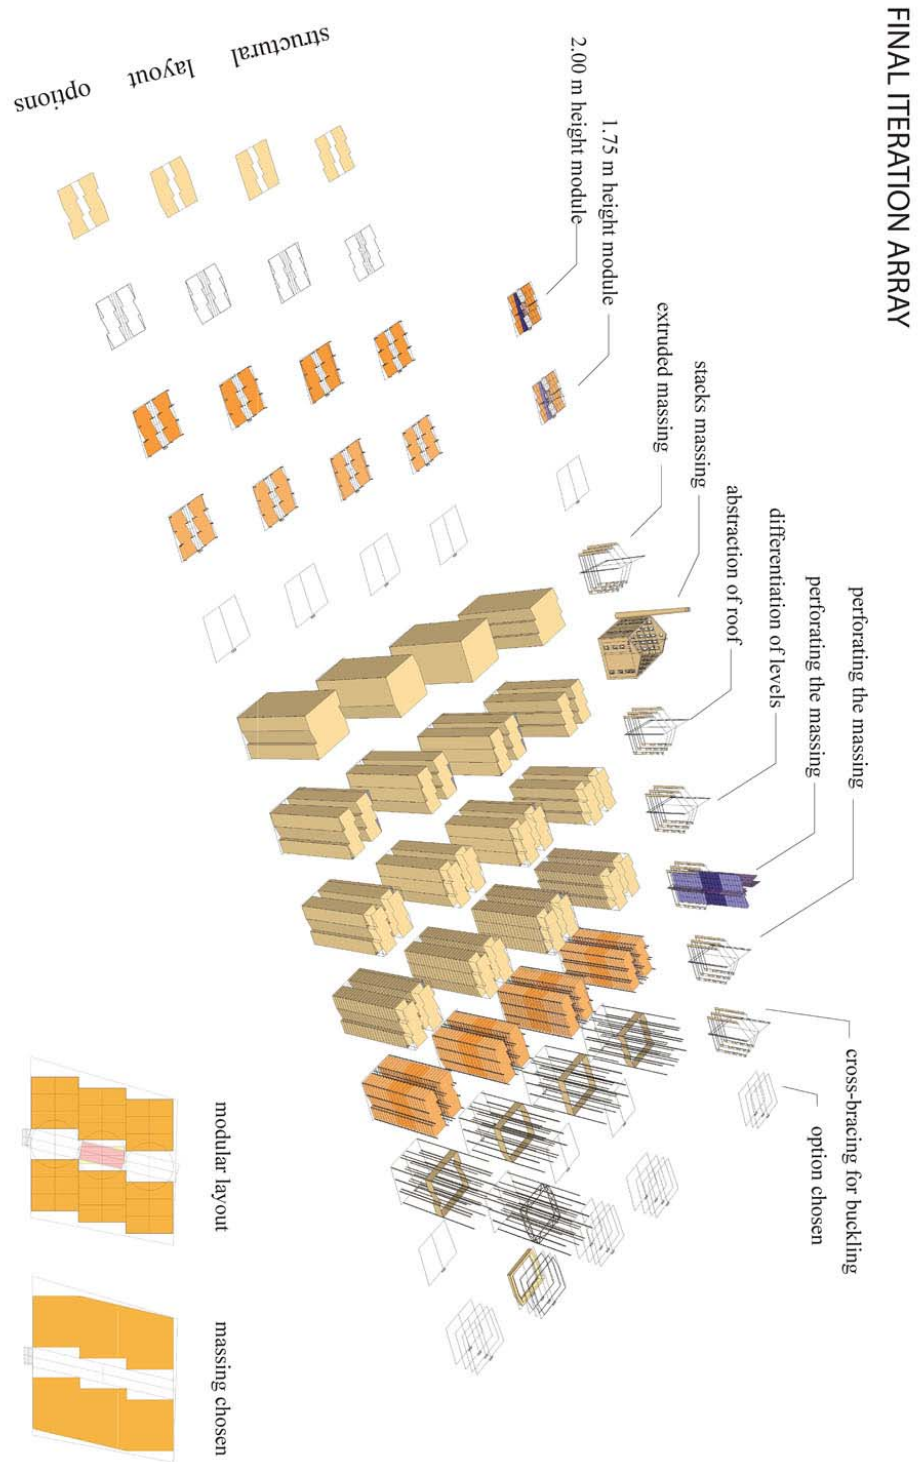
Versioning of modular layout and horizontal massing of tower.
